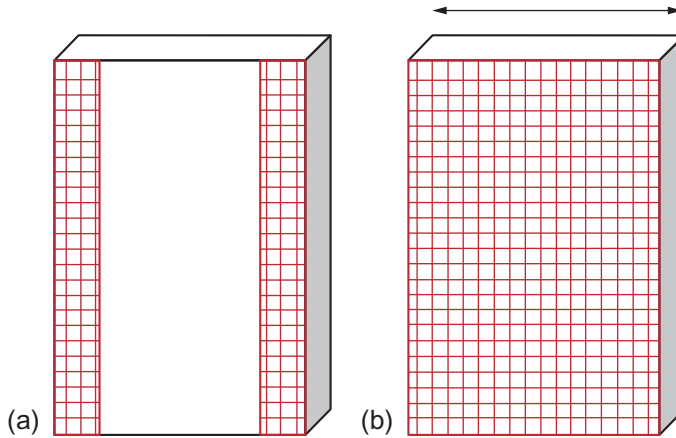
TRM strengthening of masonry walls subjected to in-plane combined bending and axial load: (a) placement of fibers in the highly stressed areas and (b) full coverage of the wall.
